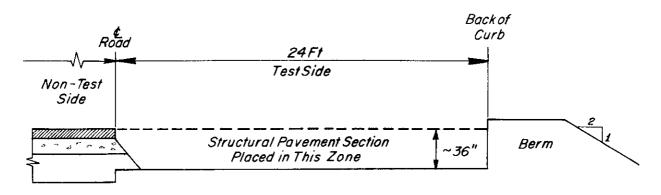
Cross-section of test section before placement of subgrade, base, and asphalt concrete.
